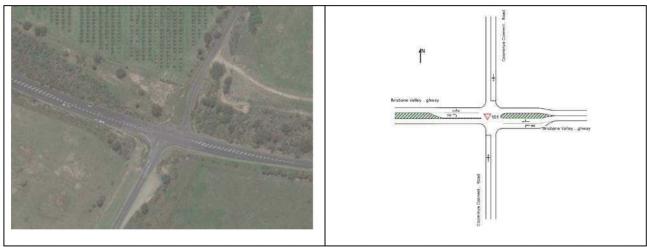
Concept Layout and SIDRA Layout – Brisbane Valley Highway / Coominya Connection Road
